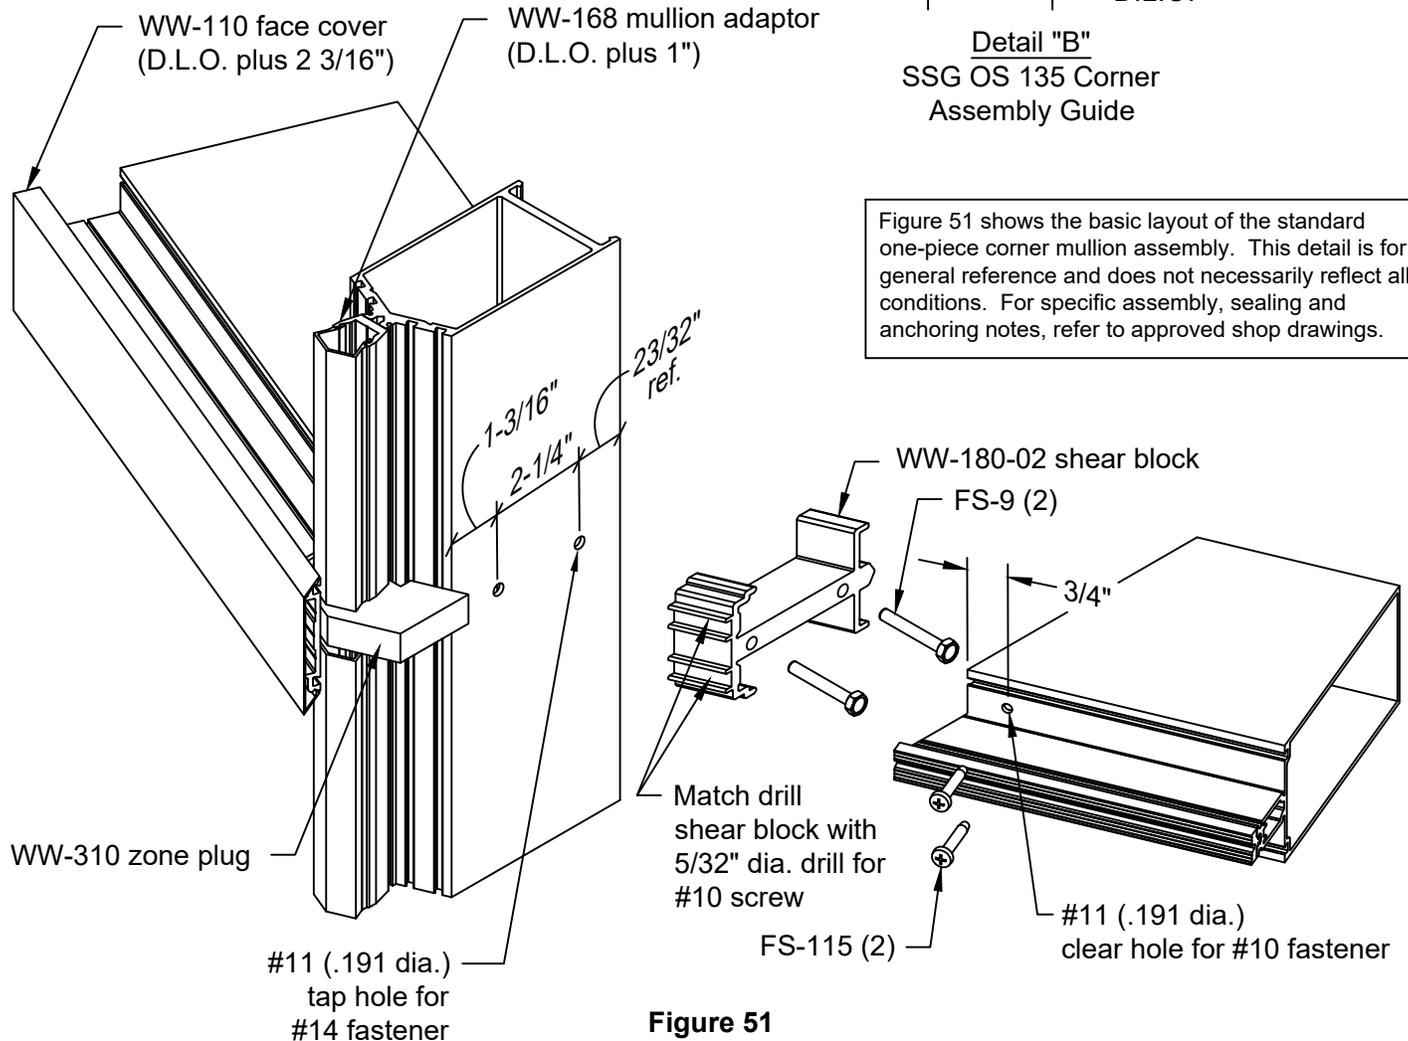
shows the basic layout of the standard one-piece corner mullion assembly. This detail is for general reference and does not necessarily reflect all conditions. For specific assembly, sealing and anchoring notes, refer to approved shop drawings.
